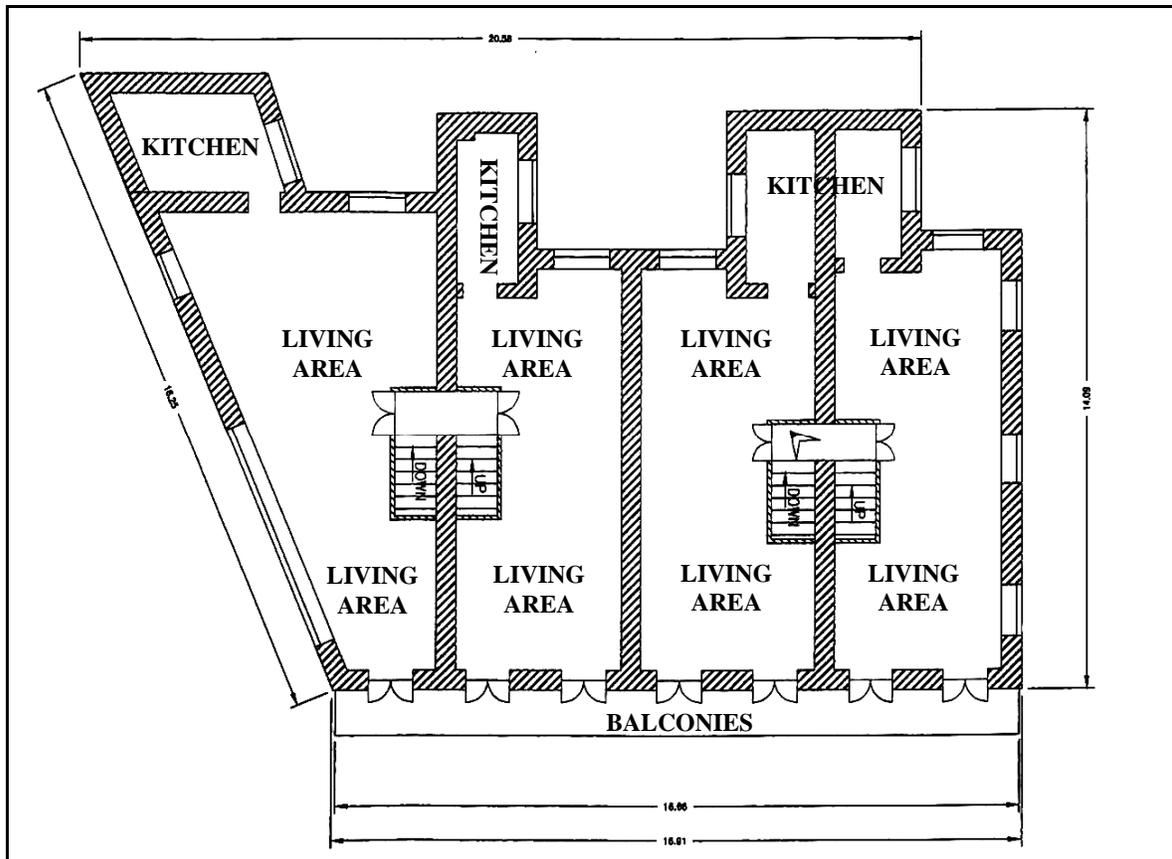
First-floor Plan of the Blue House, showing the layout of spaces. (Source: Architectural Services Department)
